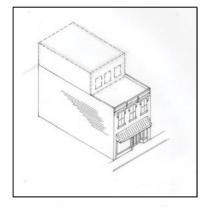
Recess rooftop additions so that they are not readily visible from the street. Mimic roof forms of the main building in the addition.
